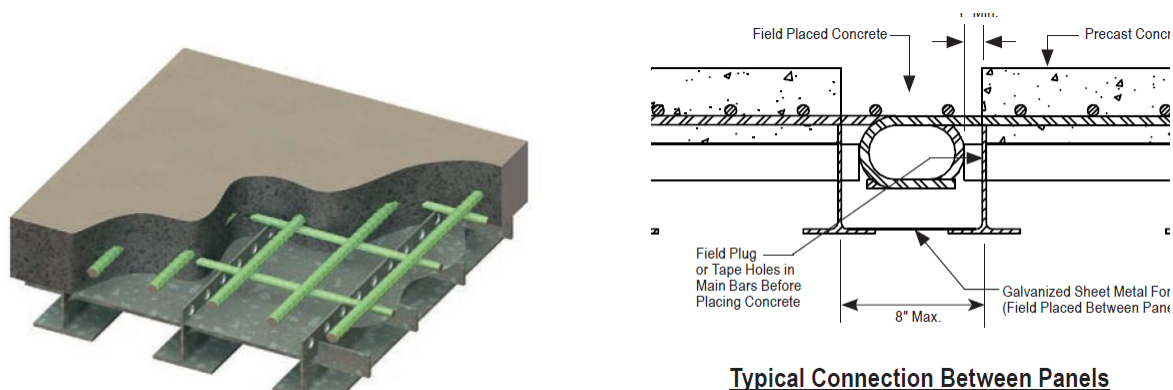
Concrete half-filled grid installation<sup>7</sup>
